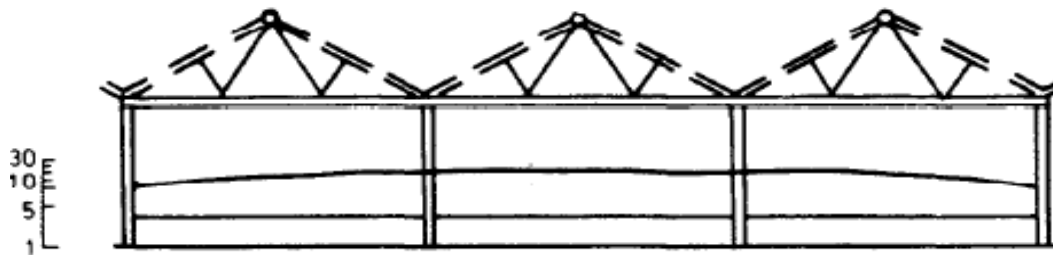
SHED TYPE ROOF WITH CONTINUOUS STRIPS OF GLAZING
